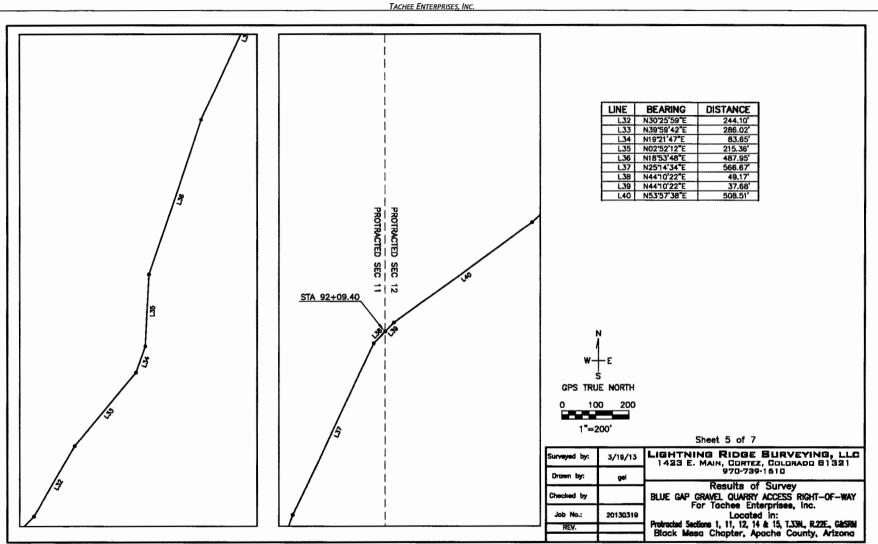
Proposed Access Road ROW plat (Page 4 of 6).
